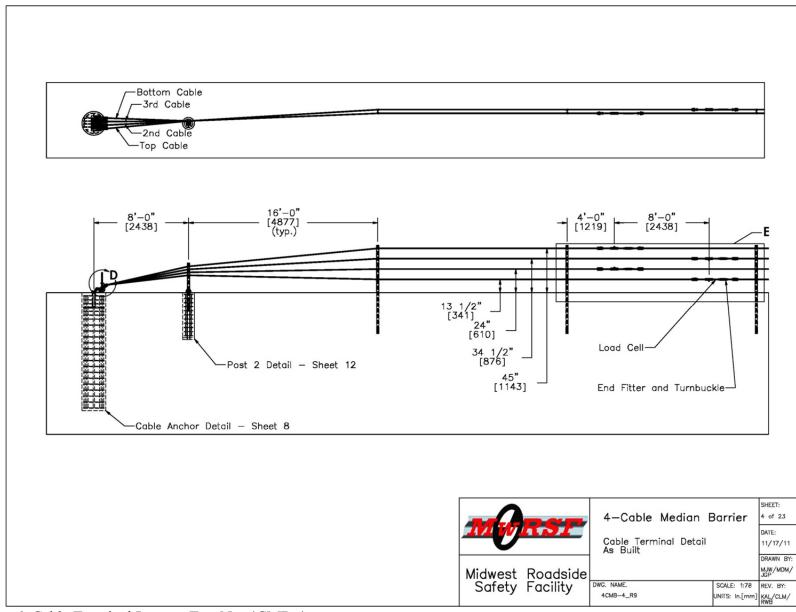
Cable Terminal Layout, Test No. 4CMB-4
